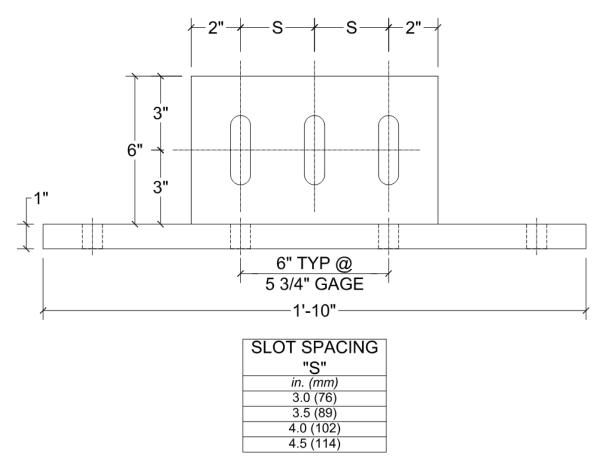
Parametric Elevation of Experimental Specimen.
